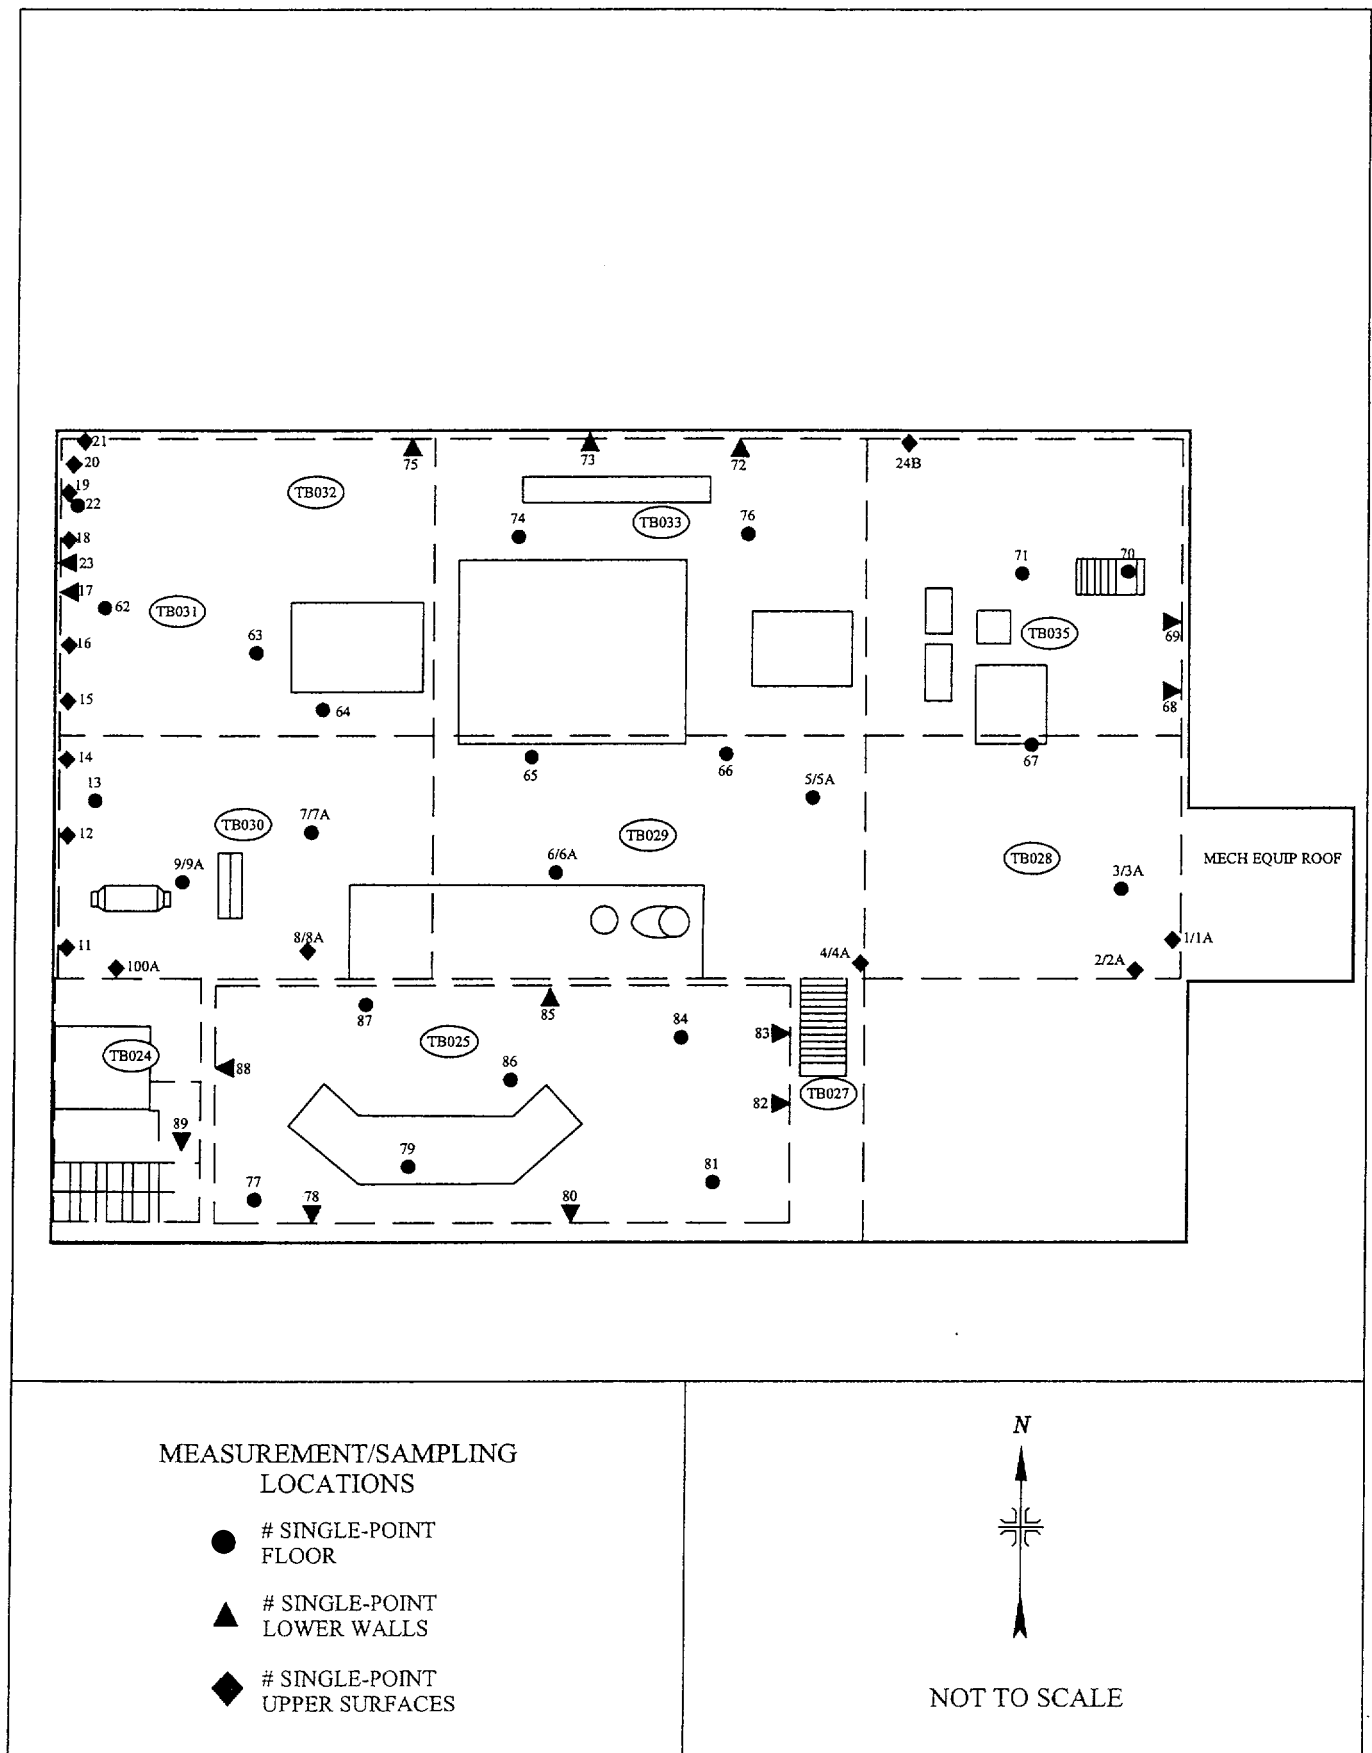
Turbine Building, Operating Floor Level - Measurement and Sampling Locations
